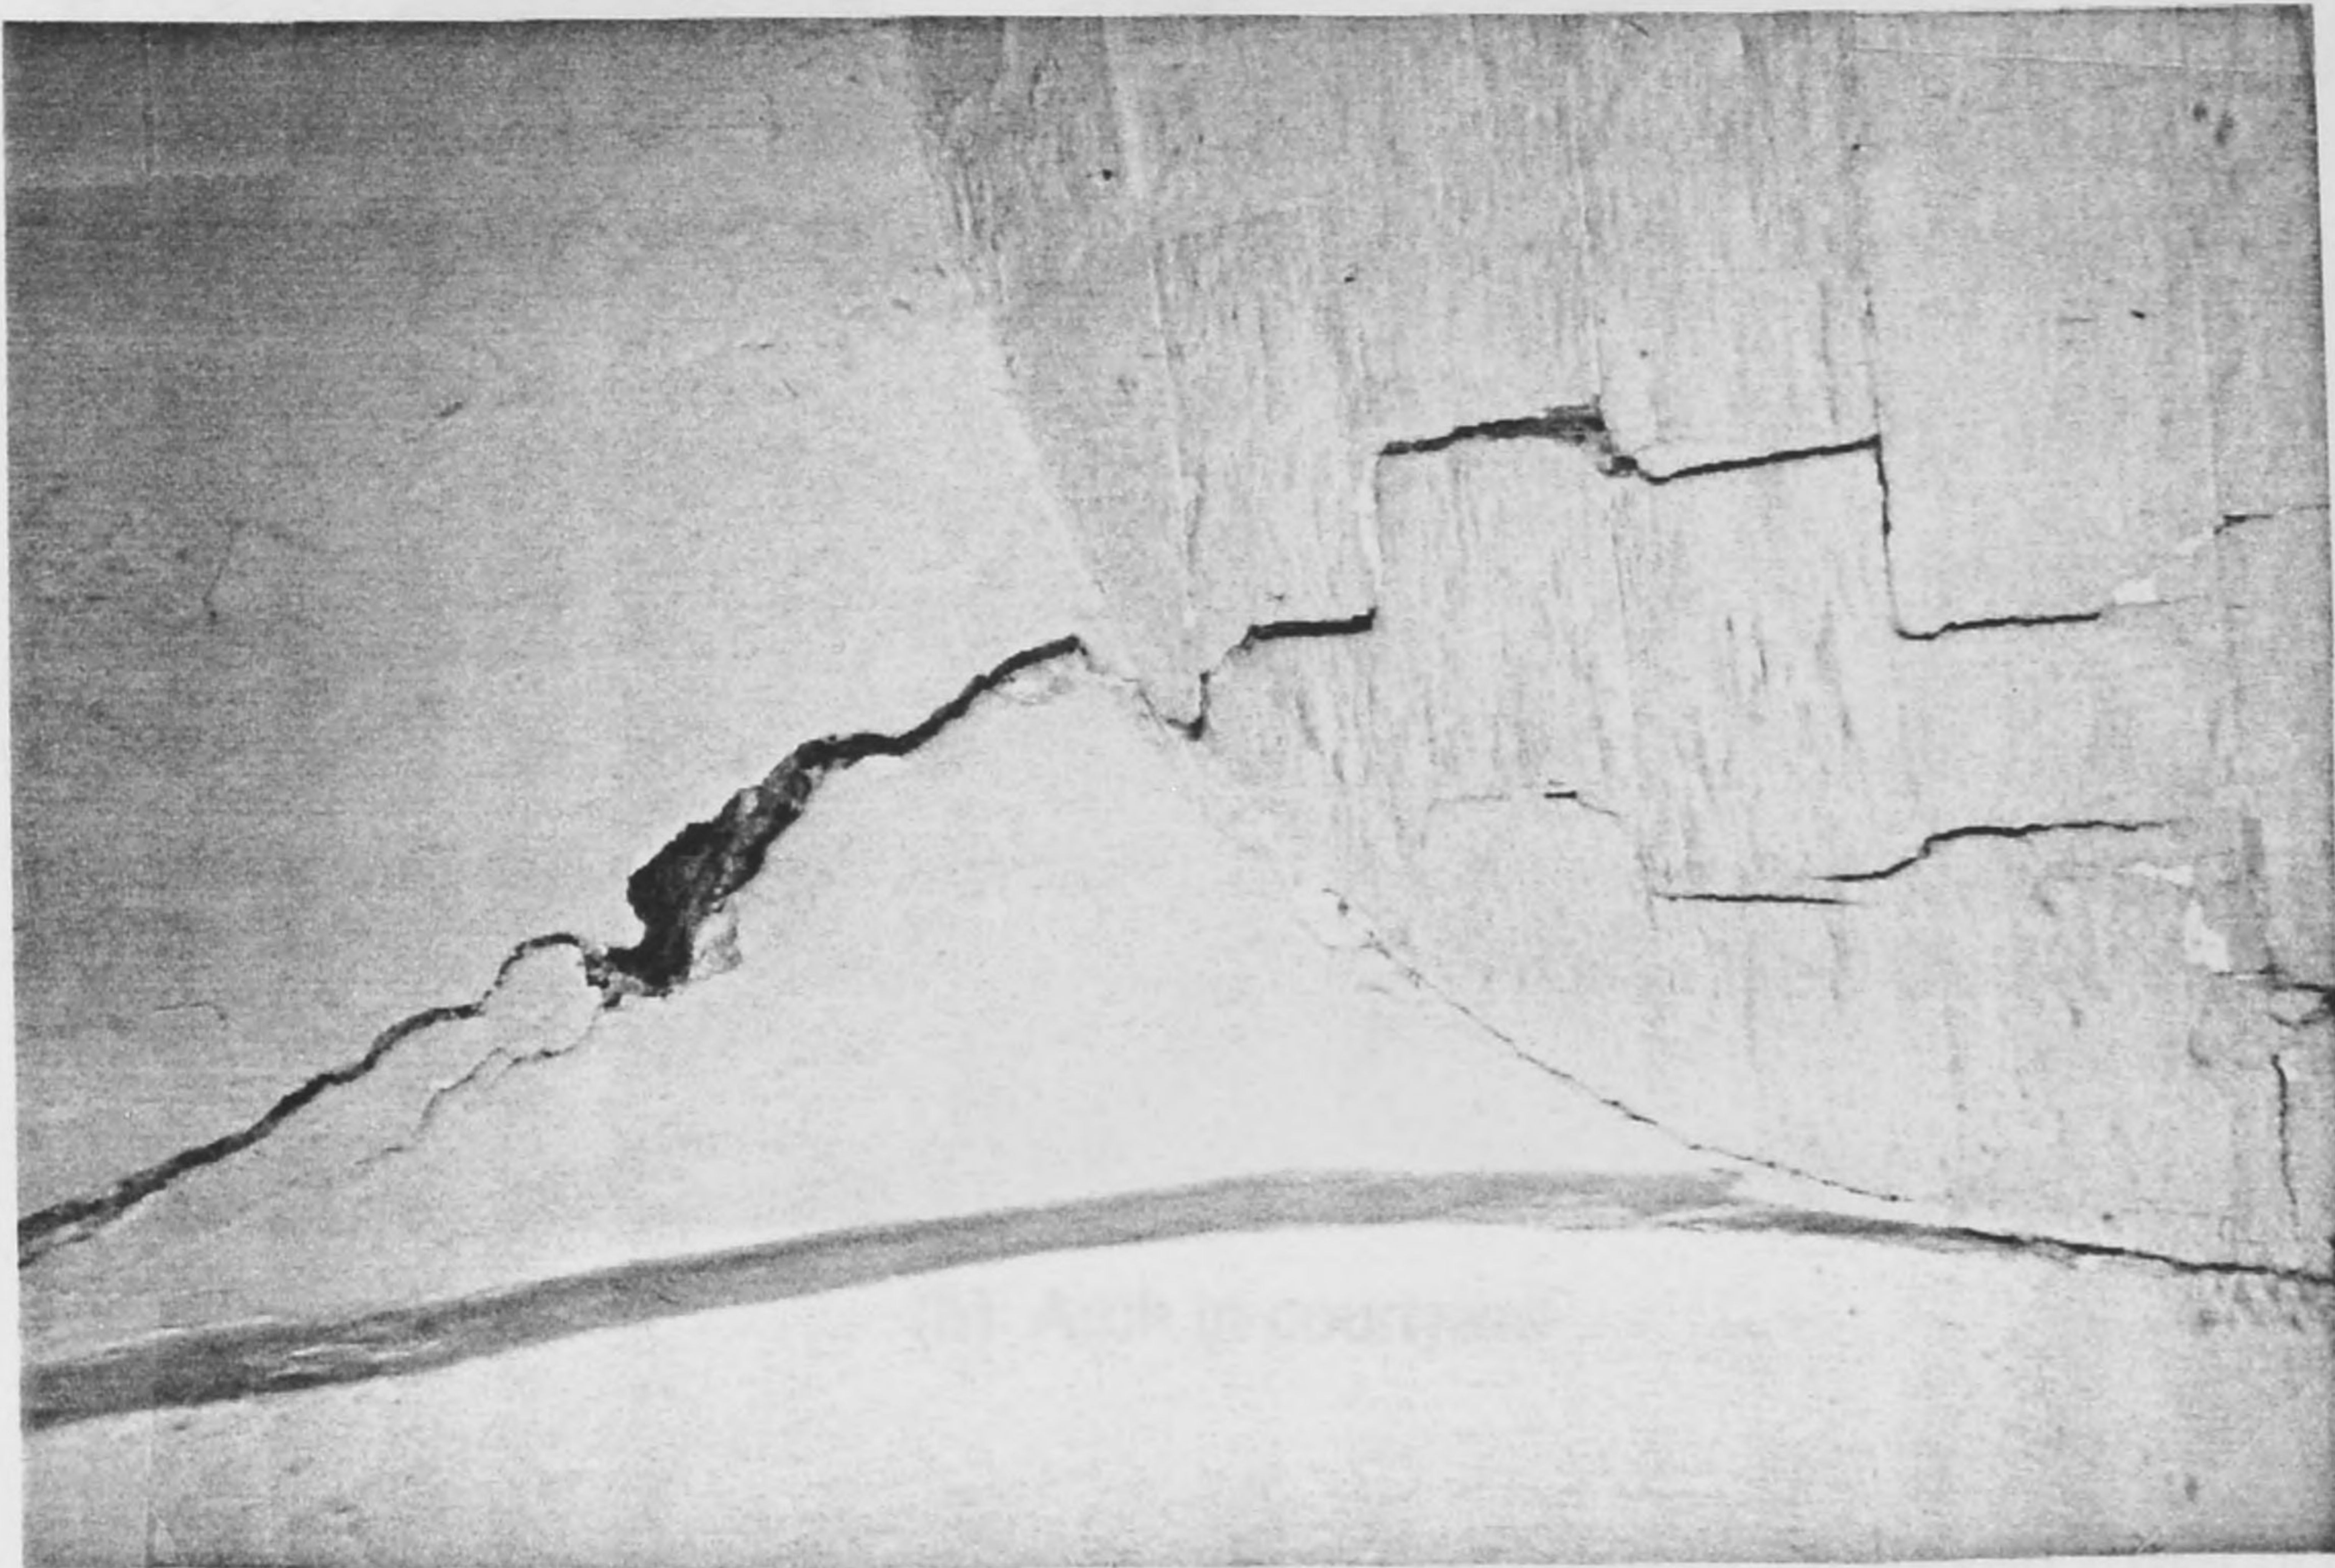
Cracked and spalled domes inside Takkayah Preschool
